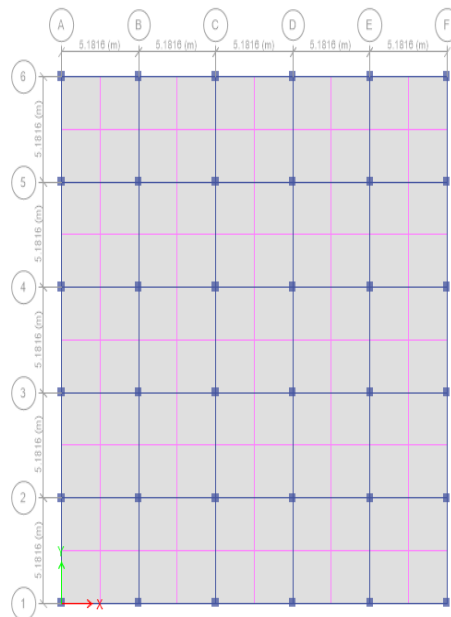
RCC building with AAC bricks as infill material. (Plan of building with AAC Bricks as infill material)
